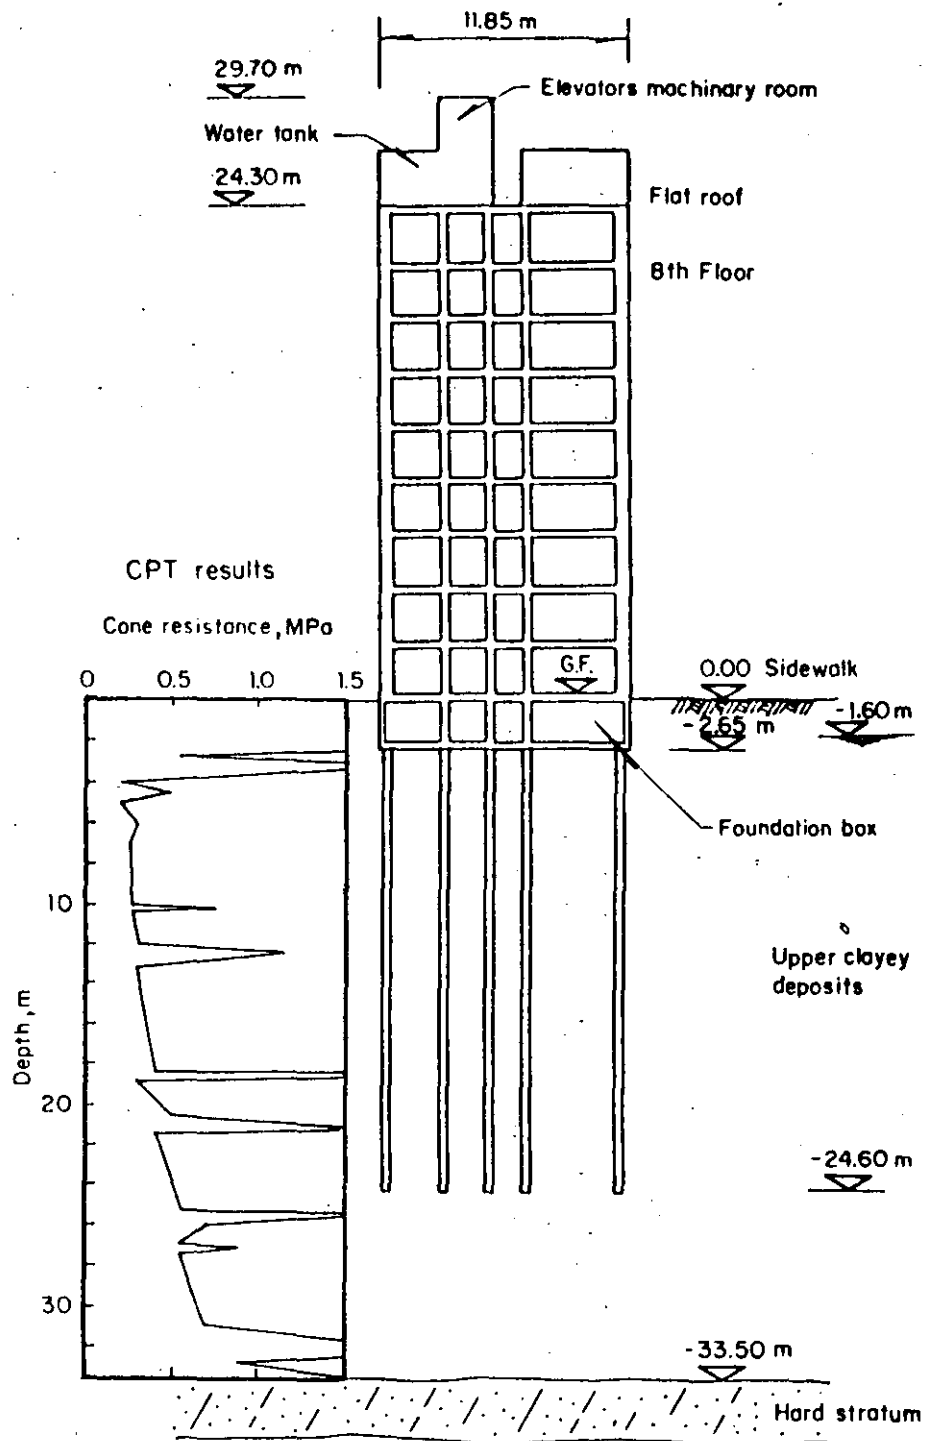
Elevation of the Building V including foundation and geotechnical conditions.
